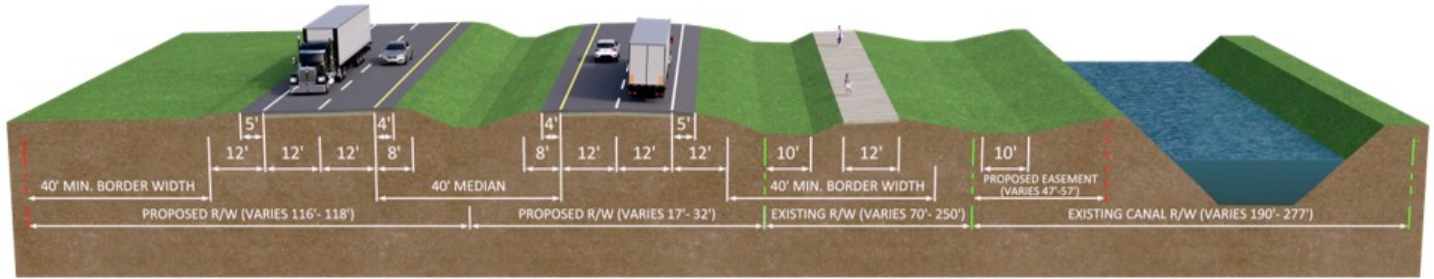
Preferred Alternative Roadway Typical Section: Harney Pond Canal C-41 to Indian Prairie Canal C-40
